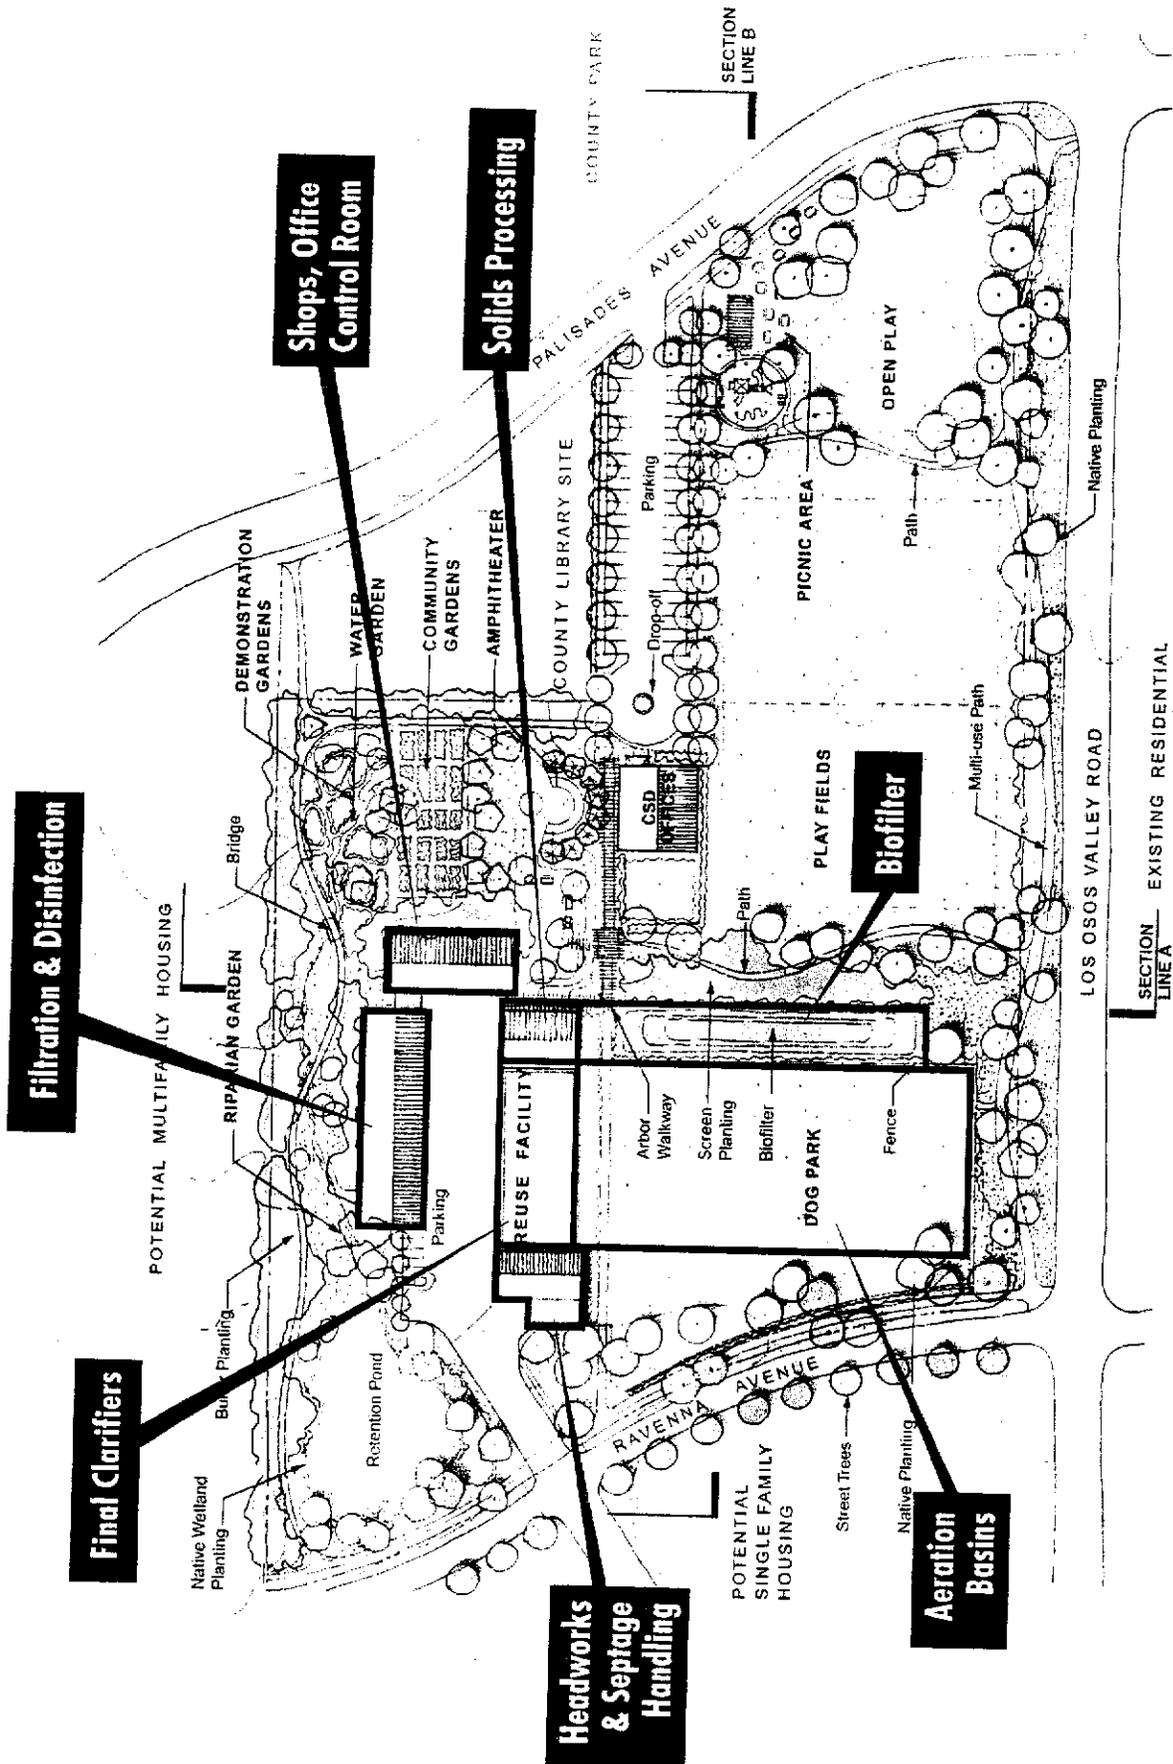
Conceptual Site Plan for Treatment Facility Site
